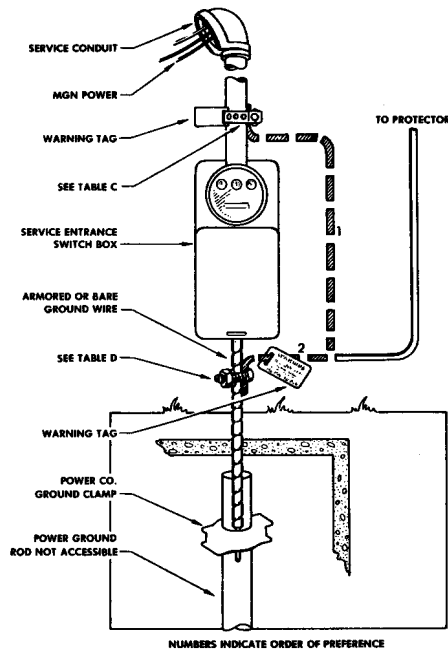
MGN Power Grounded to Ground Red—No Water Pipe—Connection to Pipe Not Possible
